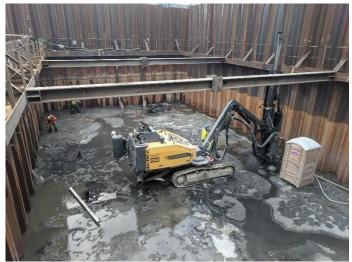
Installation of Rock Anchors Through Tremie at Pier 2
